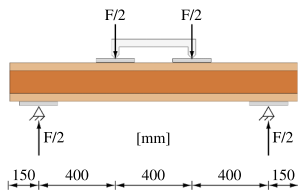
Test for shear resistance according to EN 13377. The 1.50 m long beam is loaded with two single forces and supported at two locations at the end of the beam.
